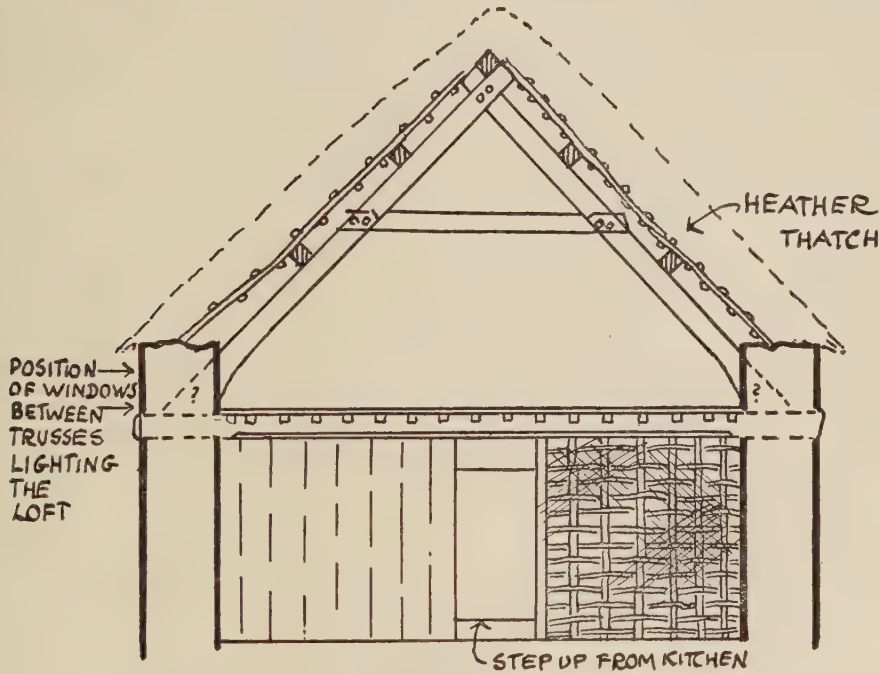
PANT-Y-BETTWS: CROSS-SECTION OF UPPER HOUSE ON LINE B-B' ;
